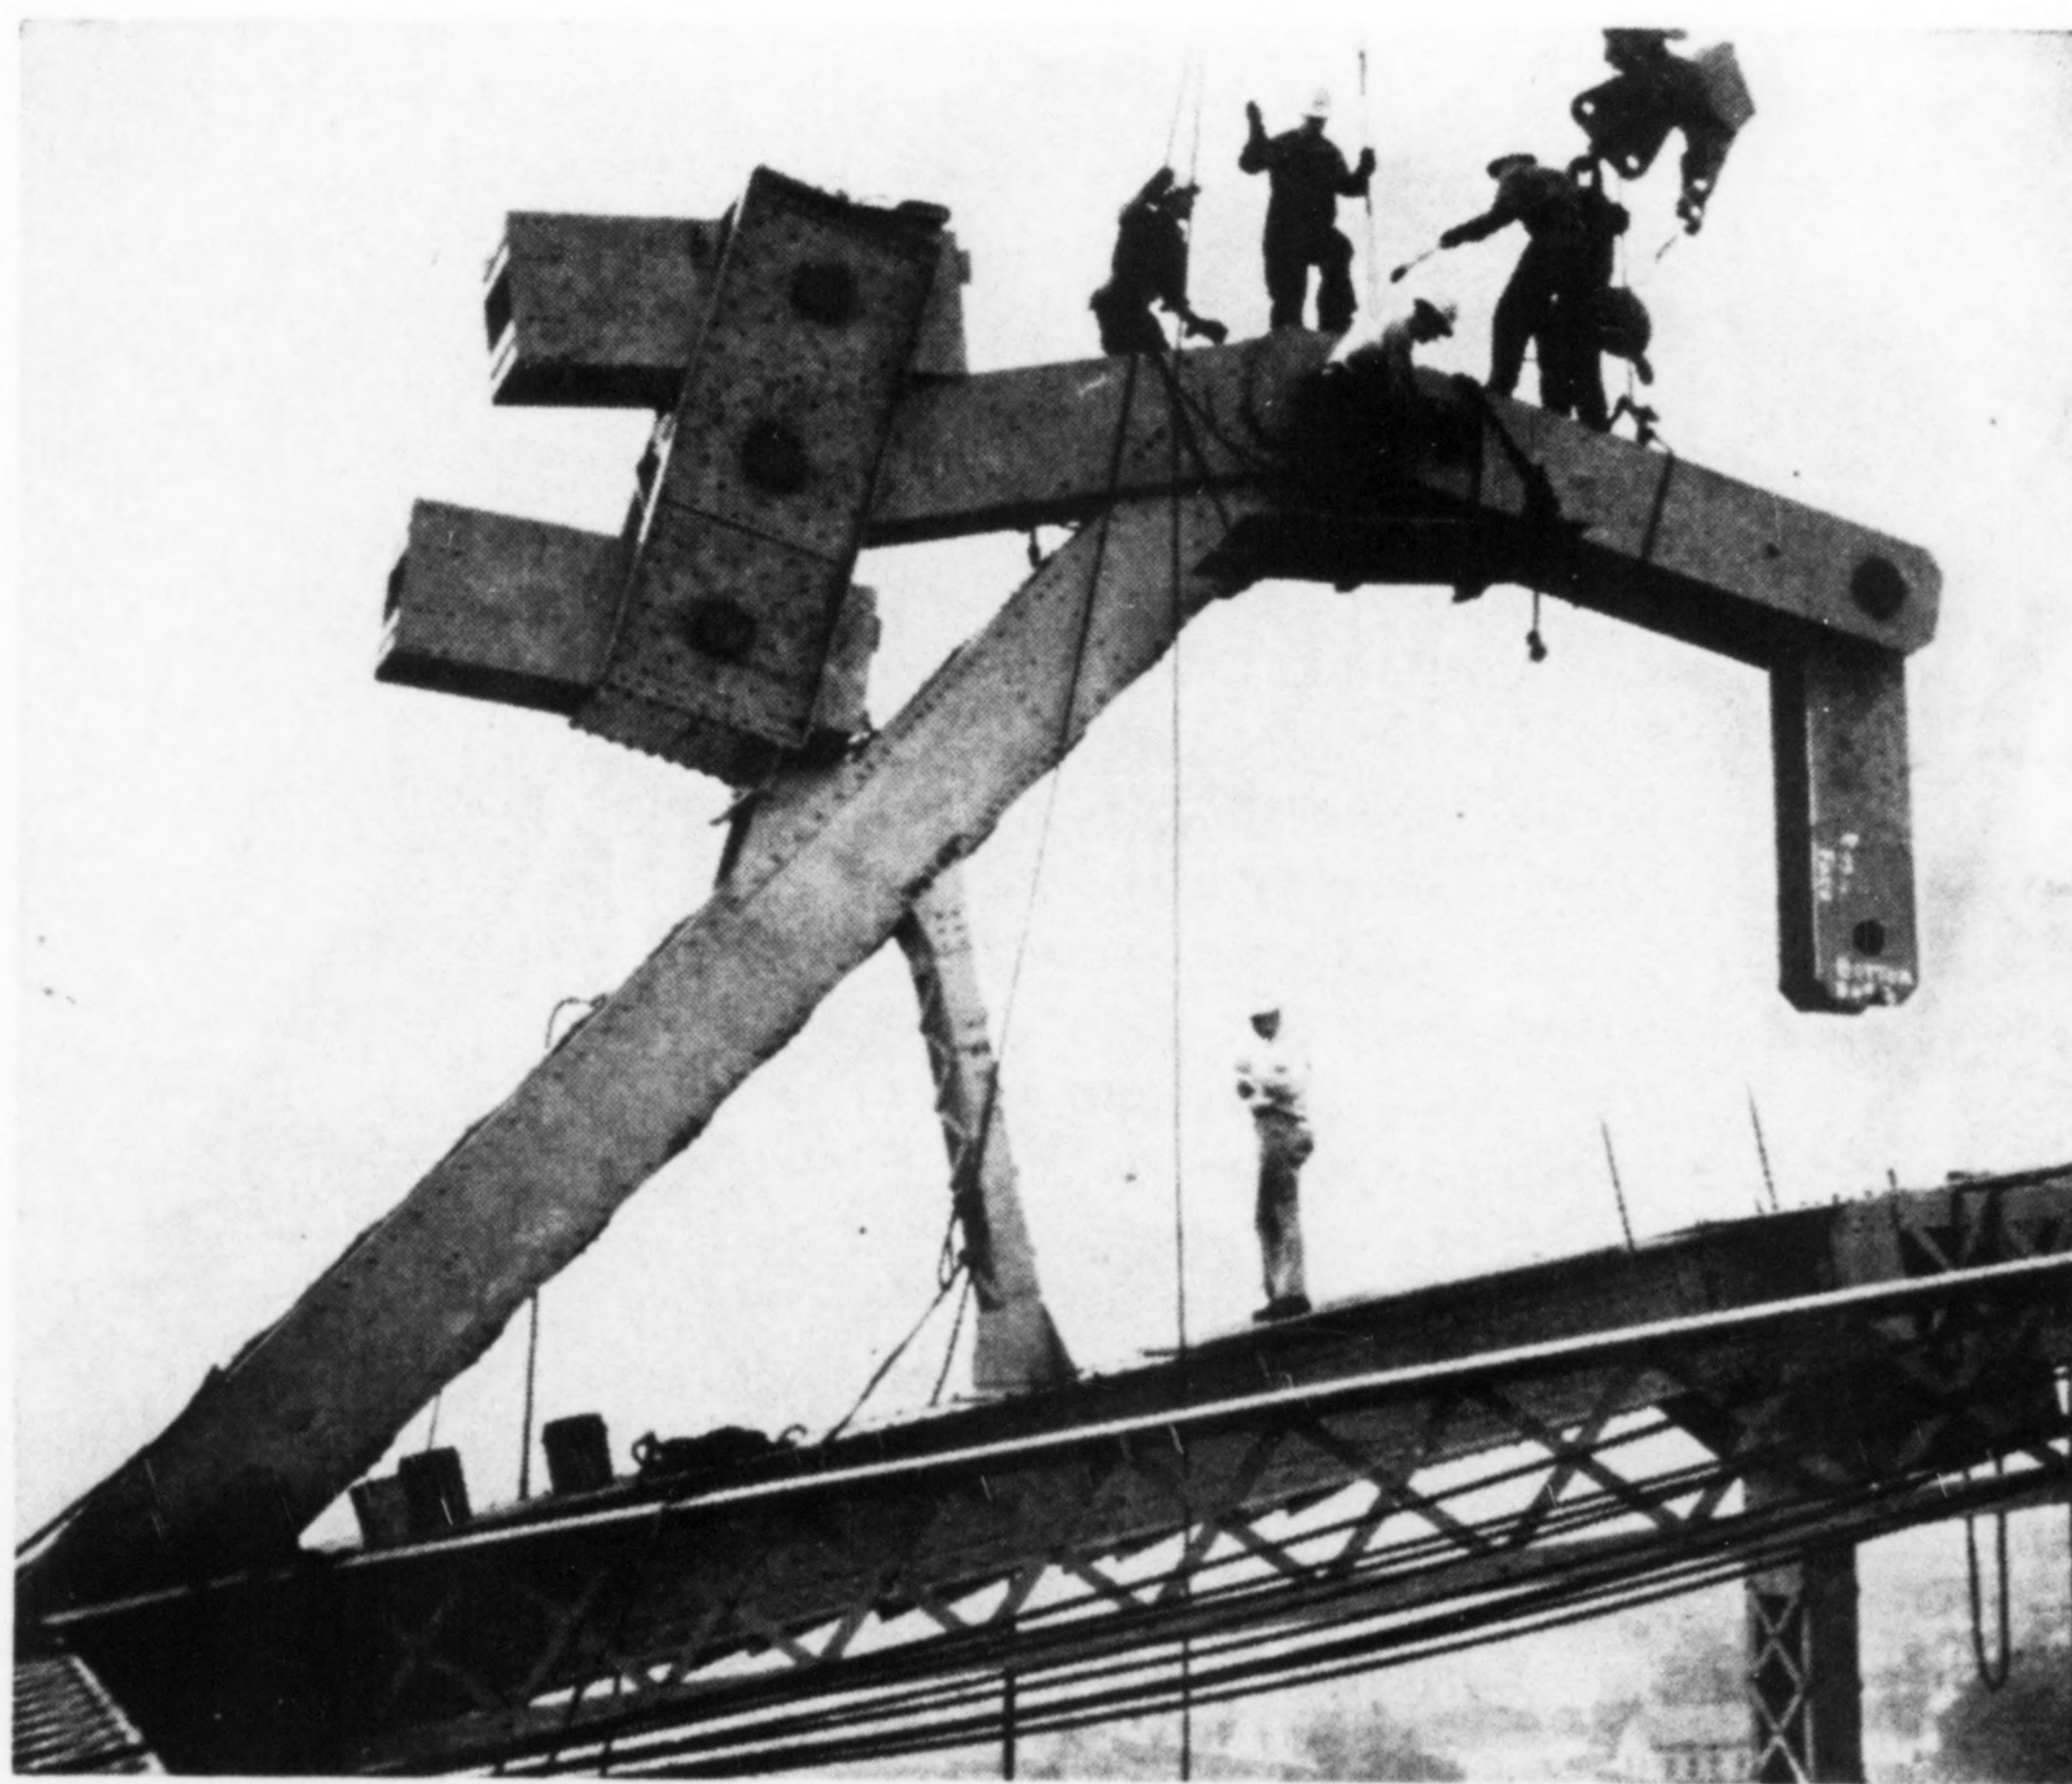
Erecting an A-frame of the cable tieback system. The member being placed will incorporate a 500-ton hydraulic jack for adjusting the cables.
